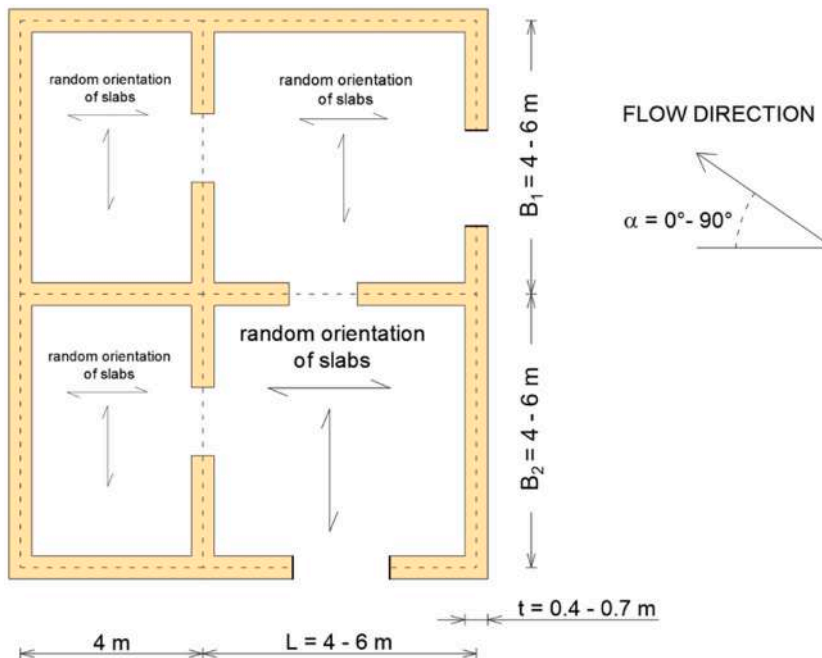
Plan geometry model of the classes of masonry buildings analyzed.
